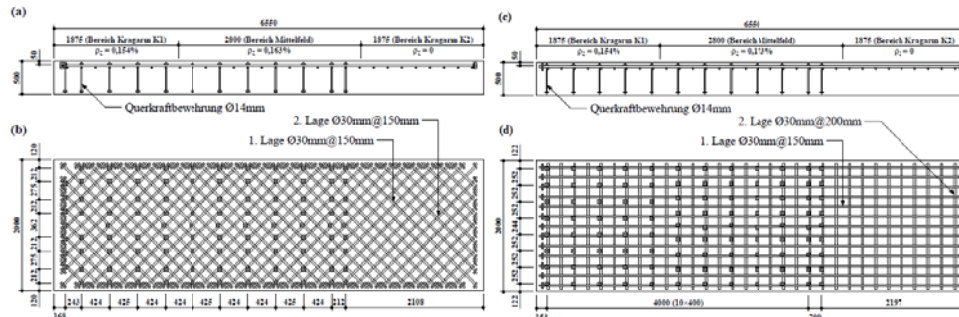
a) Longitudinal section of reinforcement of B4; b) Plan of reinforcement of B4; c) Longitudinal reinforcement of B5; d) Plan of reinforcement of B5, Jaeger (2005).
